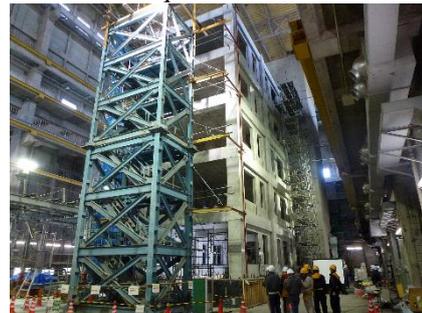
A Full-Scale Loading Test on Five Story Reinforced Concrete Building
